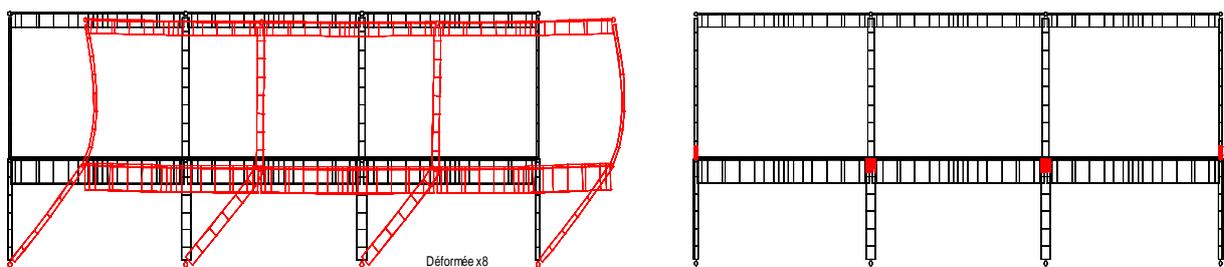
deformed shape and yield pattern at failure for the “Eisenach” frame
